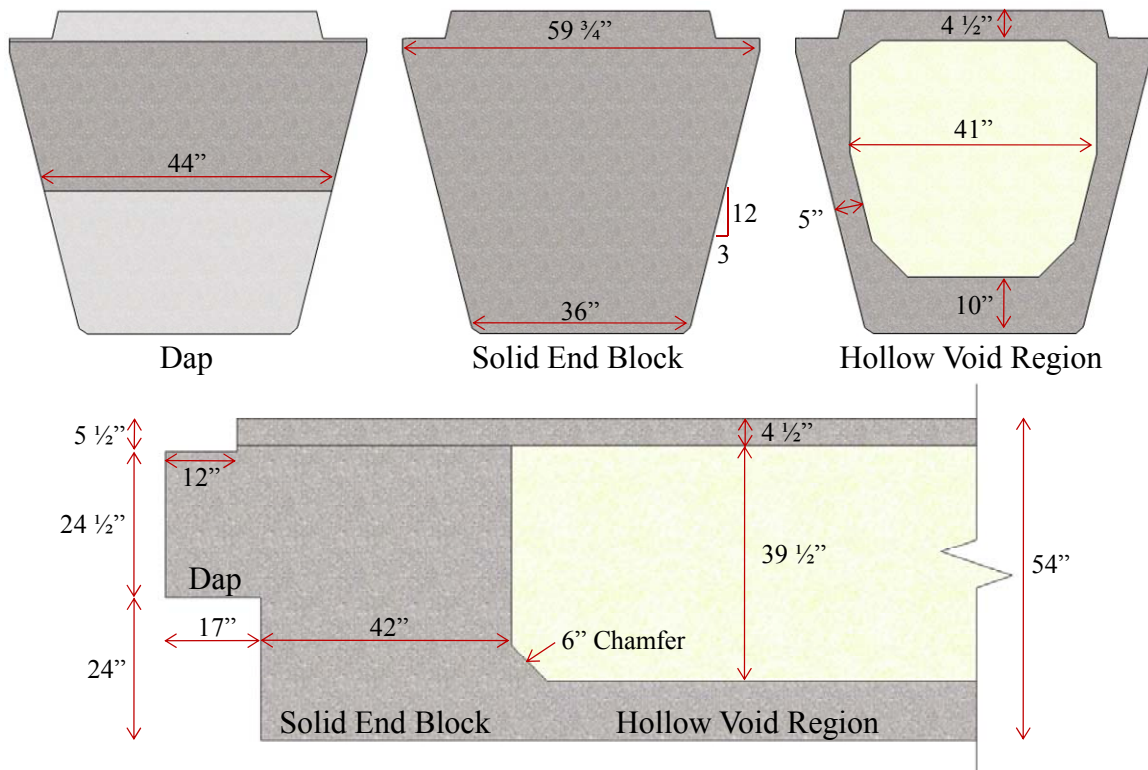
Dapped End Dimensions of the Trapezoidal Box Beams
